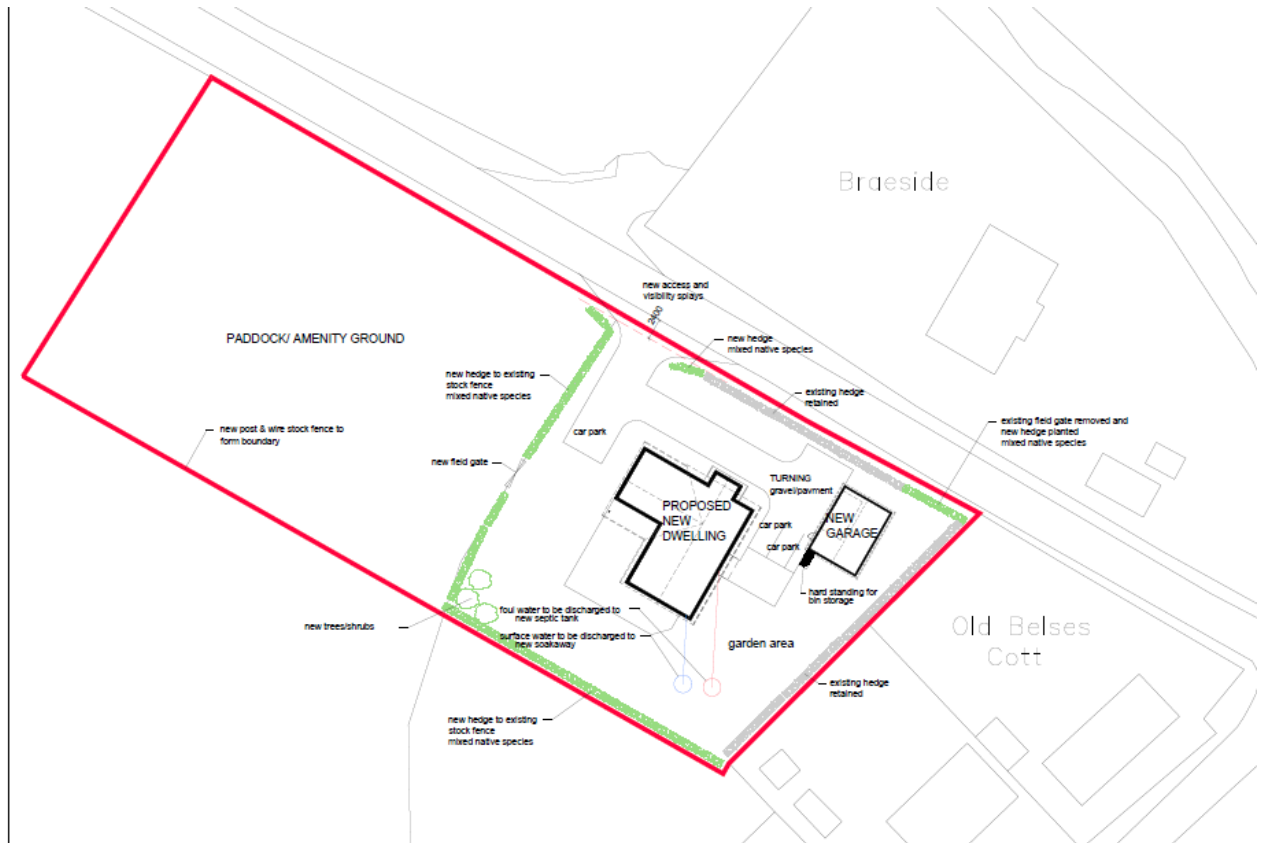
Extract from SP01(2) Proposed Site Plan (Source: Dan Wood Concept Plus).
